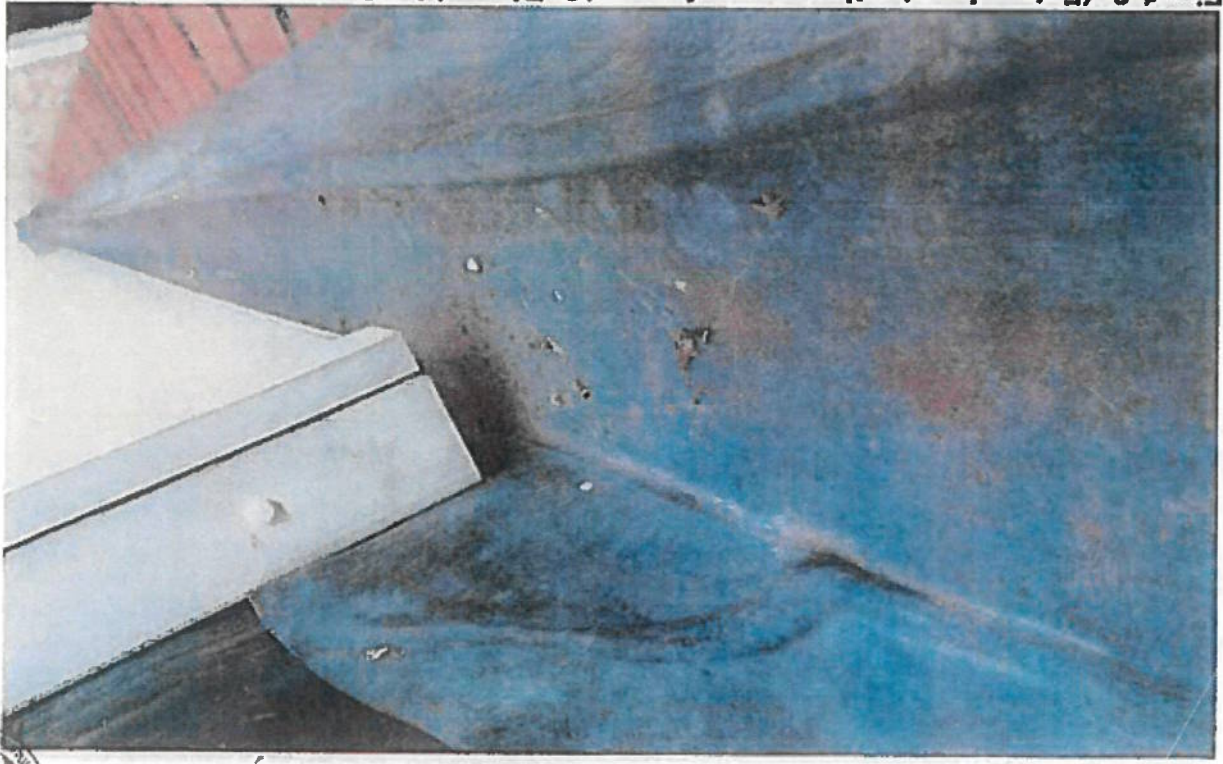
(Extension to the rear of no. 18 Riverside Grove, which has been constructed on the rear boundary / party wall between no. 17 and no. 18)
